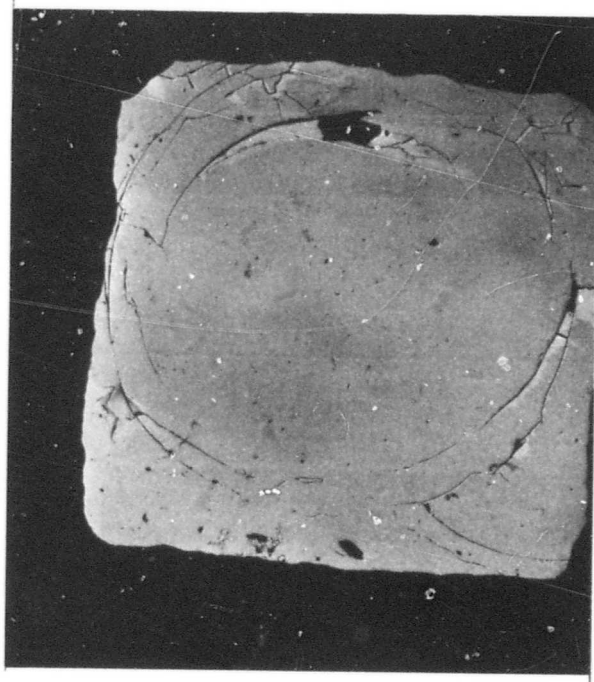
RING FRACTURE ON SPECIMEN G2 AFTER
